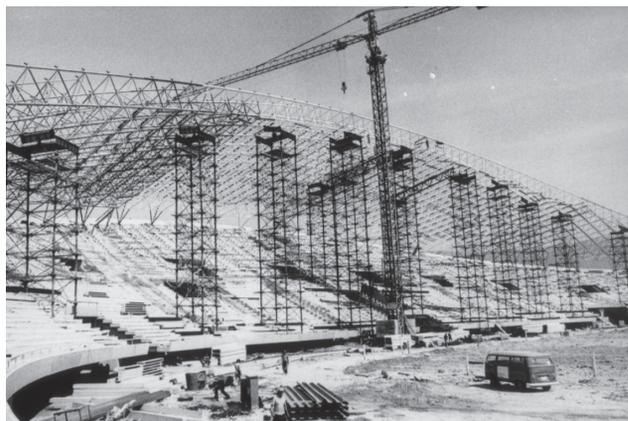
Poljud Stadium roof – construction phase [19], author HNK Hajduk
